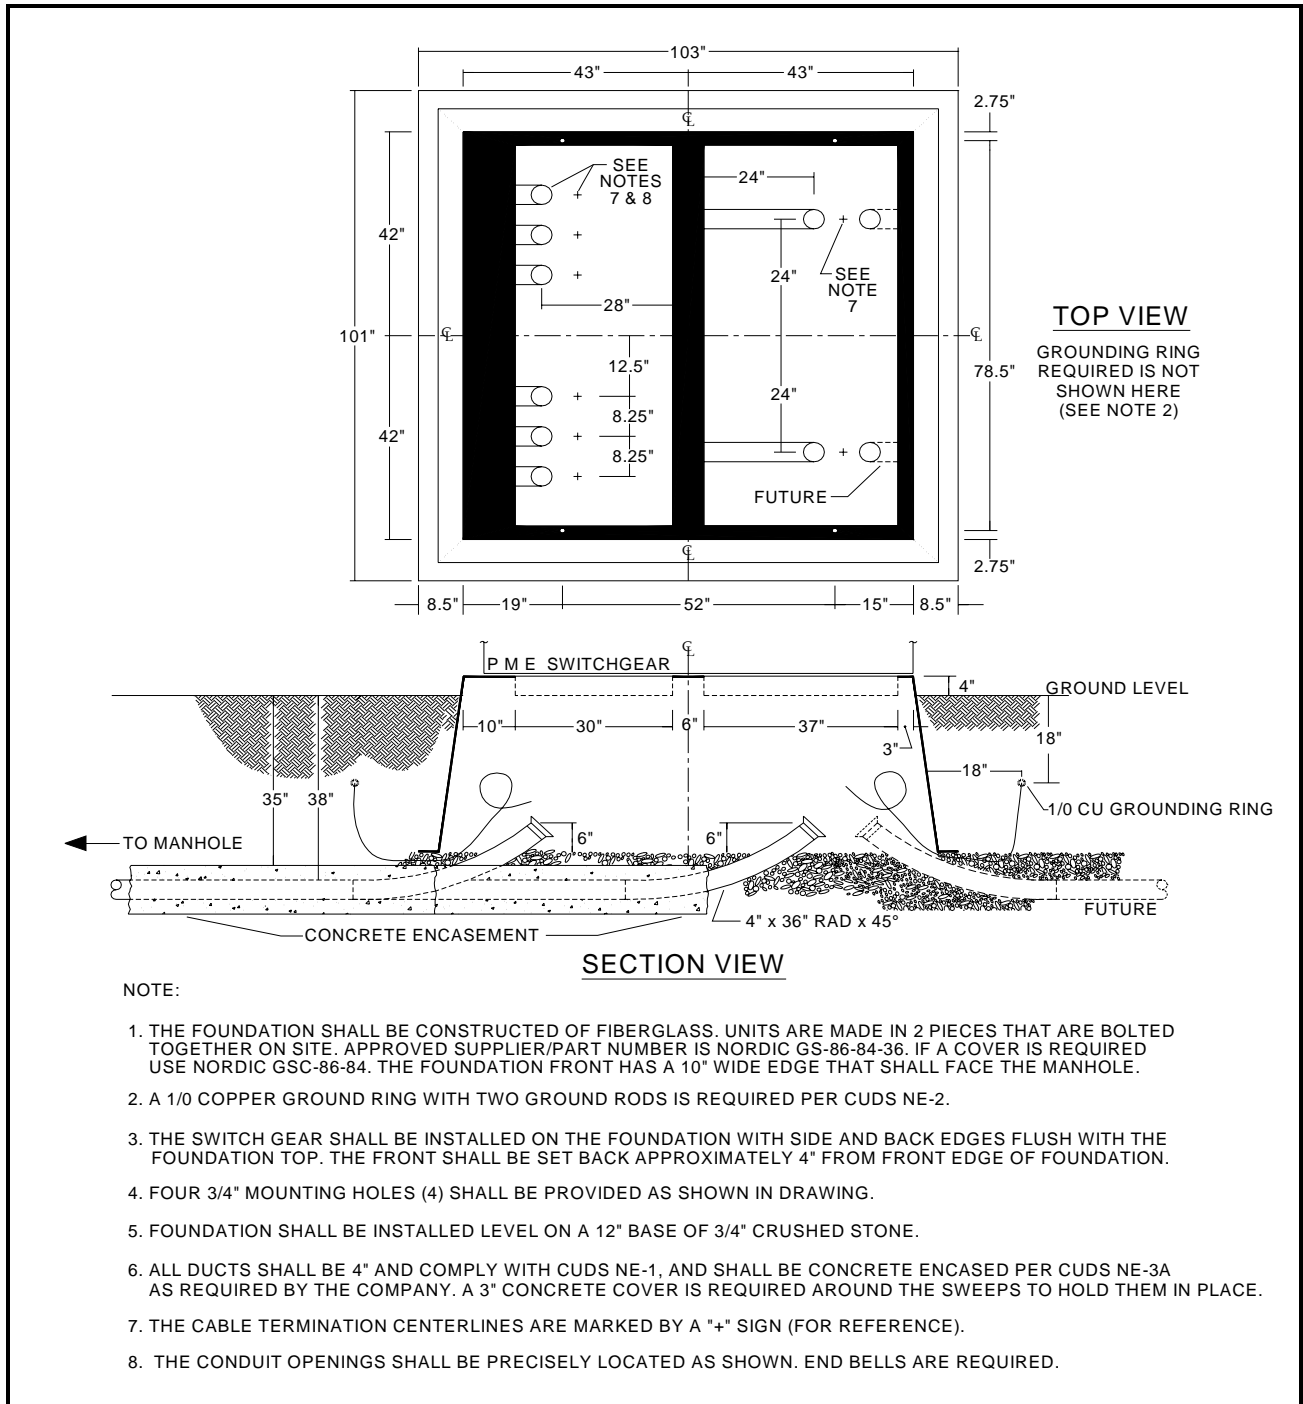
Typical 25kV Pad mounted Switchgear Foundation (Fiberglass) Installation
